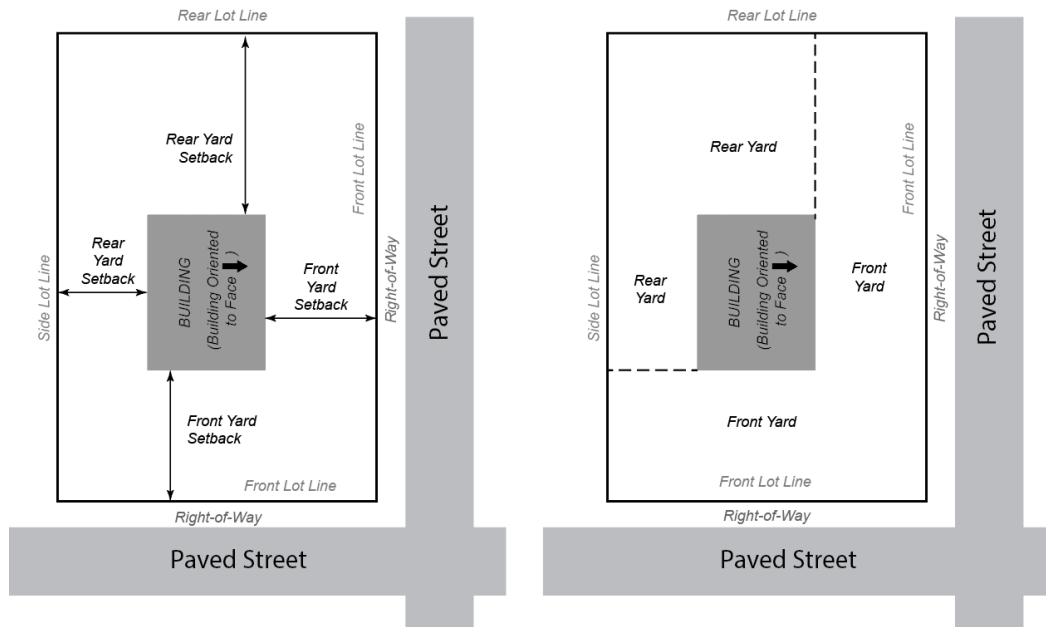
E: Typical lot lines and setback locations for a corner lot with the building oriented toward the wider street frontage (left image) and typical yard locations (right image).
